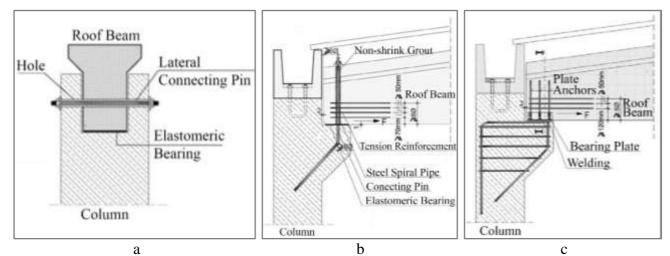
Hinged connection sections (a) Slotted connection, (b) Welded connection, (c) Pinned connection (TBDY, 2018)
